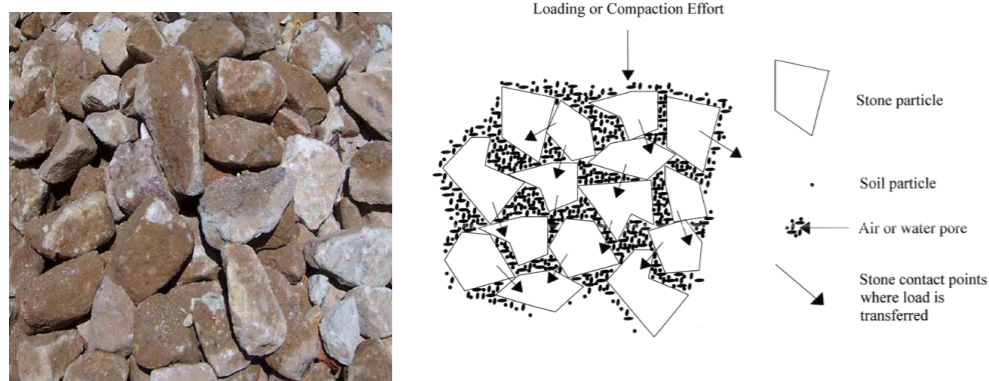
Examples of structural soils (Diagram: Cornell University)
